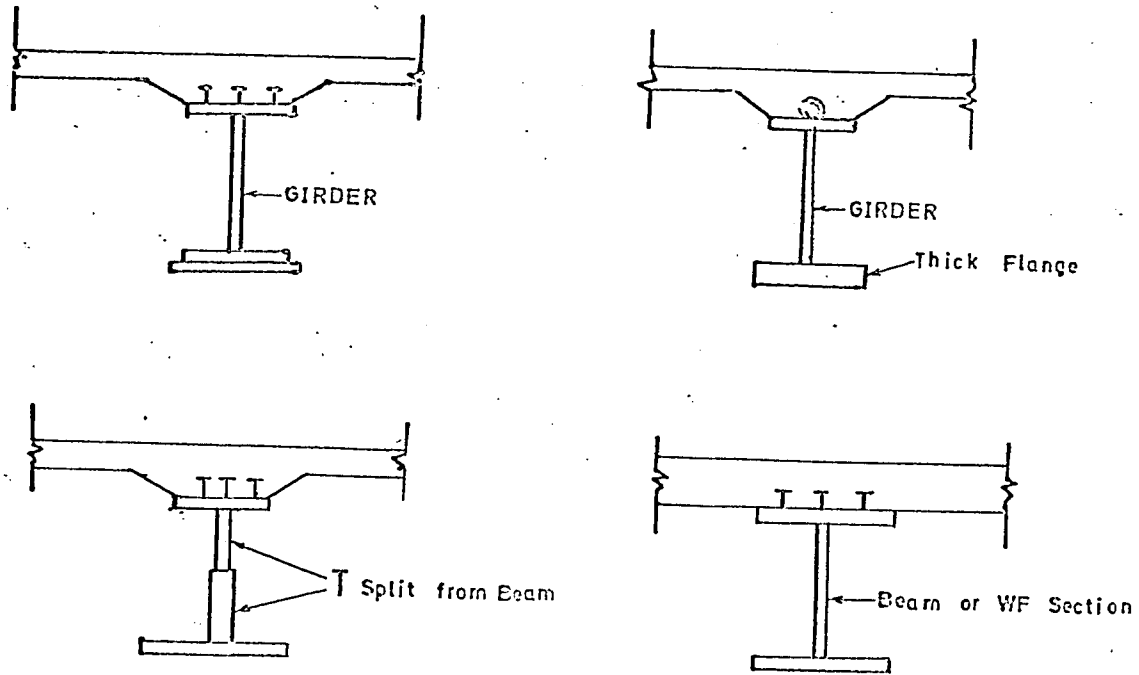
TYPICAL SECTIONS USED IN COMPOSITE CONSTRUCTION FOR BUILDINGS
